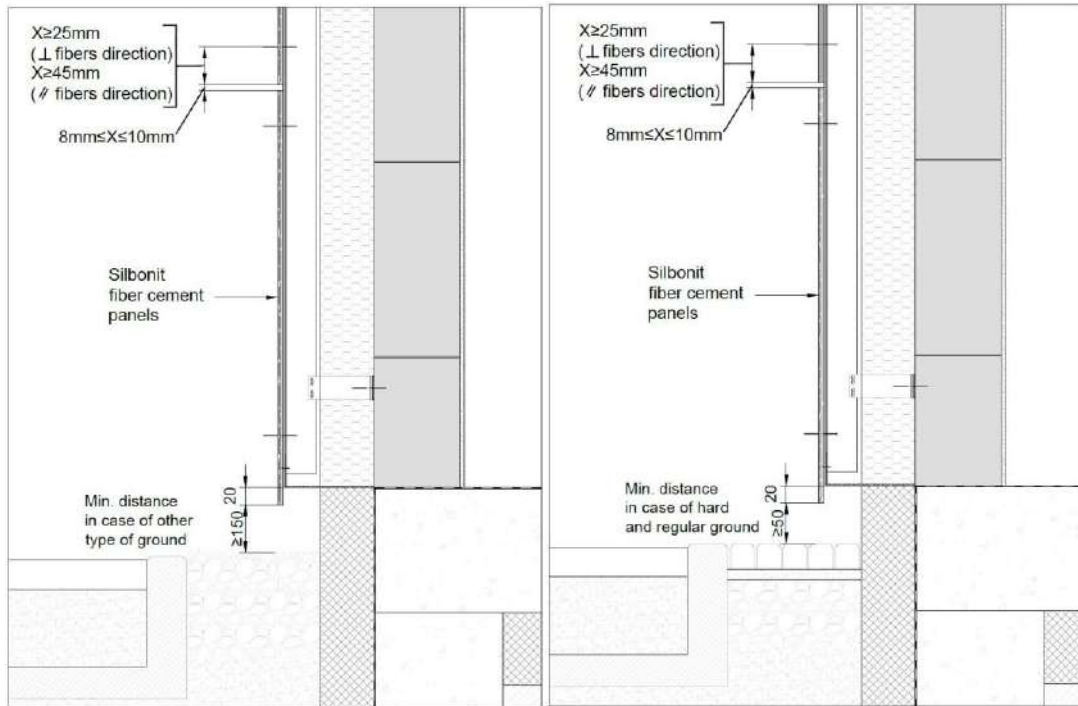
Example of vertical sections of the base of the ventilated facade cladding with two different slab solutions at the base of the building. Aluminum subframe.
